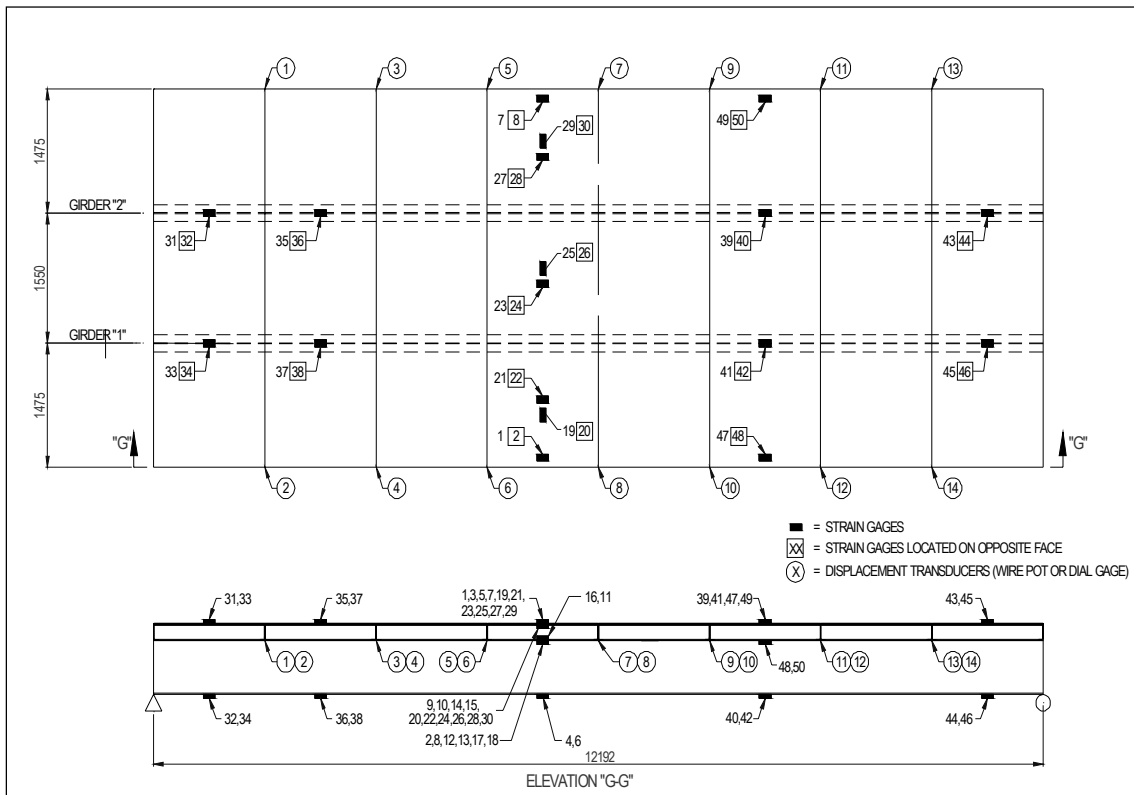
INSTRUMENTATION LAYOUT FOR LOAD CASE C2
